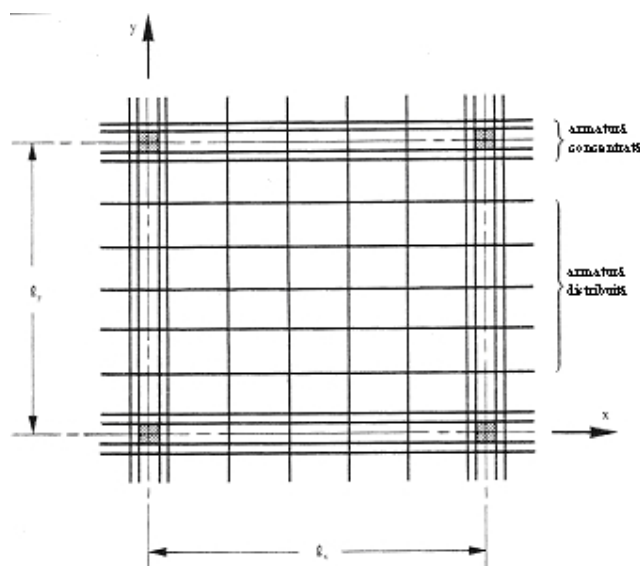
Layout of the prestressed reinforcement in flat slab [23]
